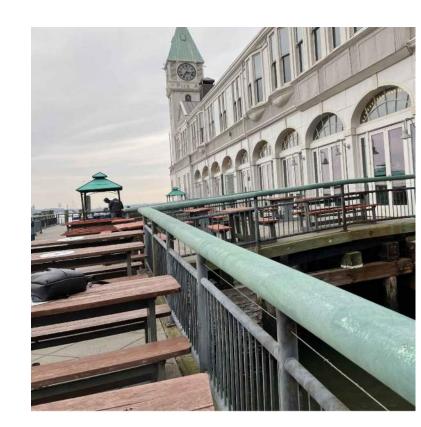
OPEN AREA #5 CORRODED HANDRAIL
